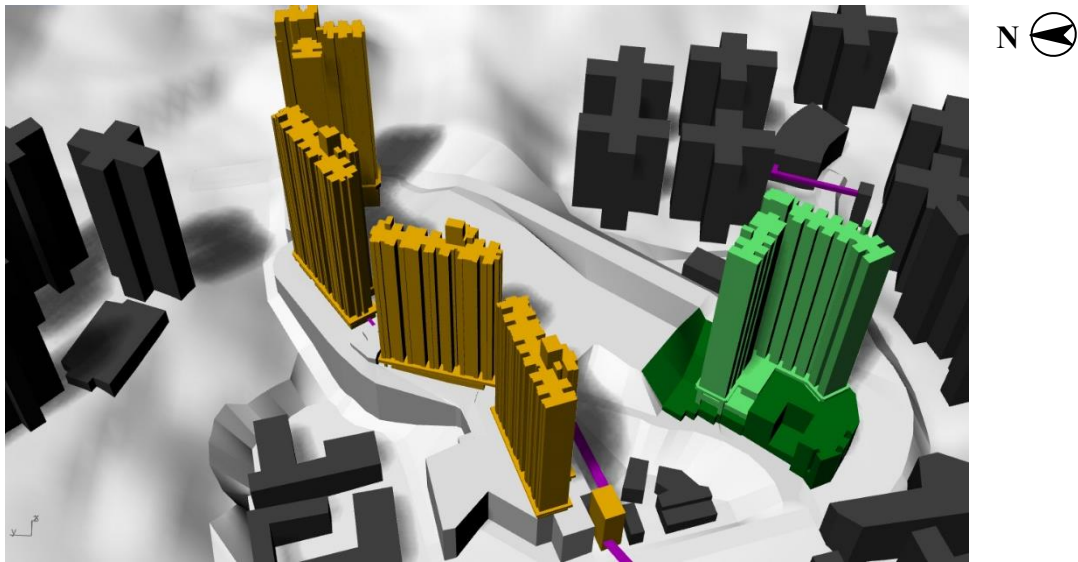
Westerly View of Planned Development Pik Wan Road Site A (Orange)
